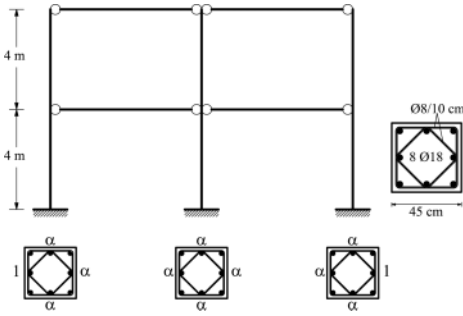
Two-storey precast concrete frame with pinned joints. Structural geometry, columns cross-section, and damage scenario with exposure levels ( $0 \leq \alpha \leq 1$ ).
